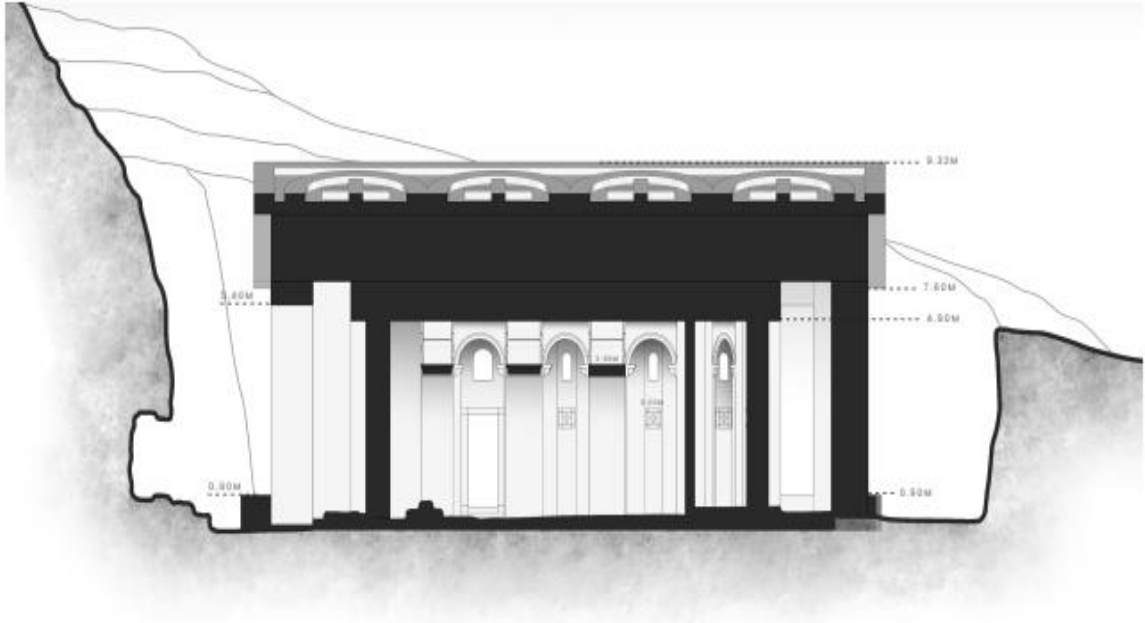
, Section B-B sectional drawing of the church (source Betsegaw Ayenew).
